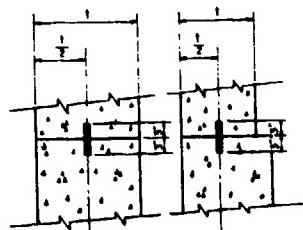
PLATE CONSTRUCTION JOINT DETAIL(TYP.)
